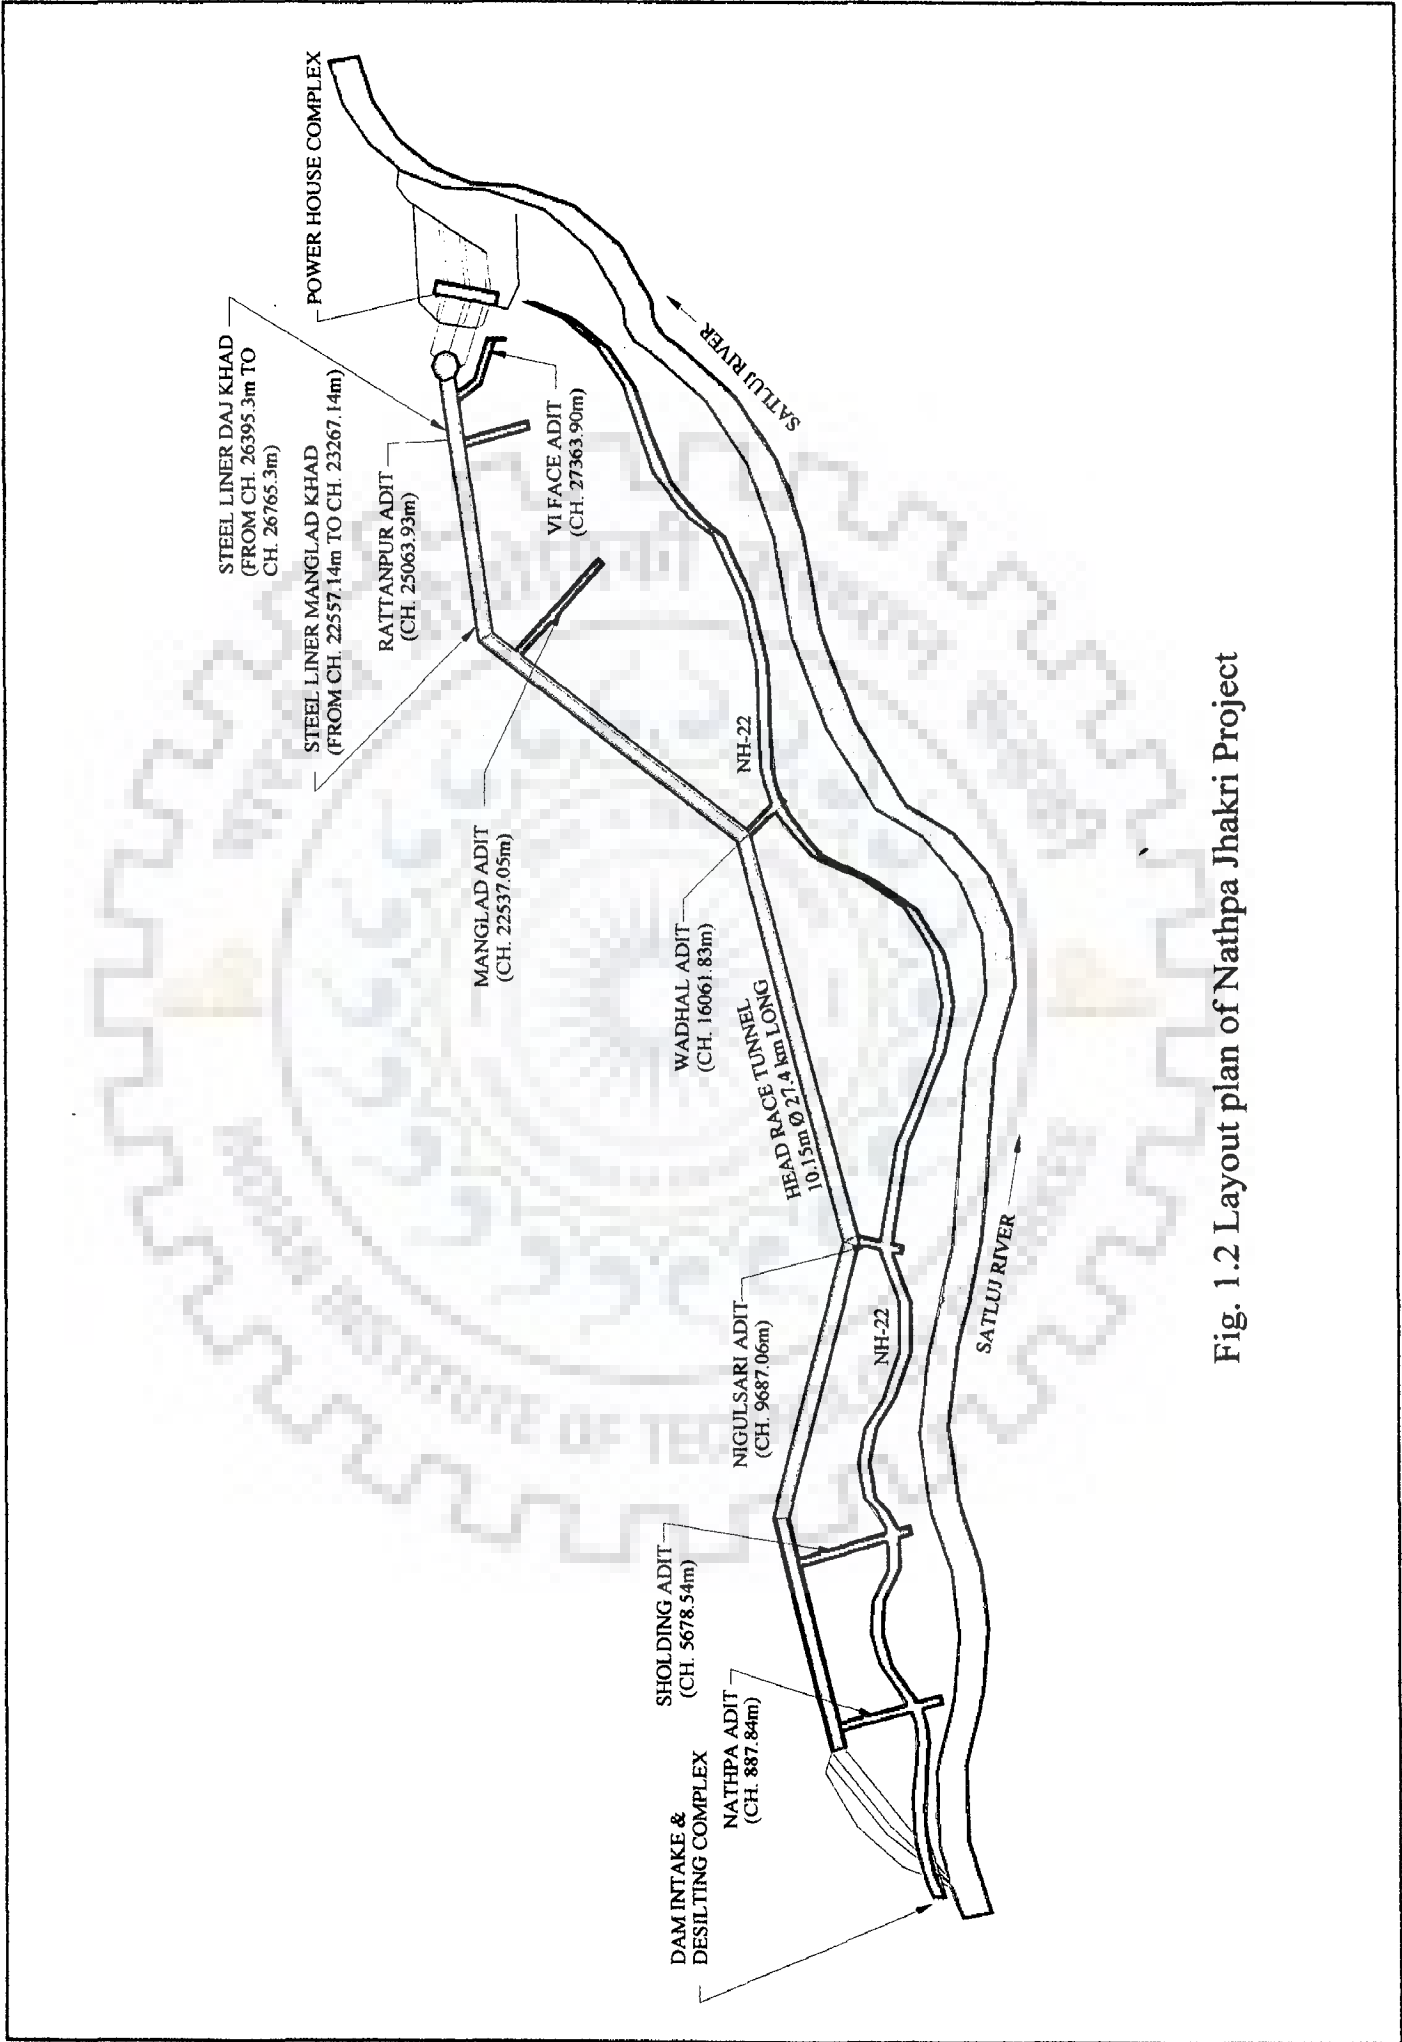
Layout plan of Nathpa Jhakri Project
